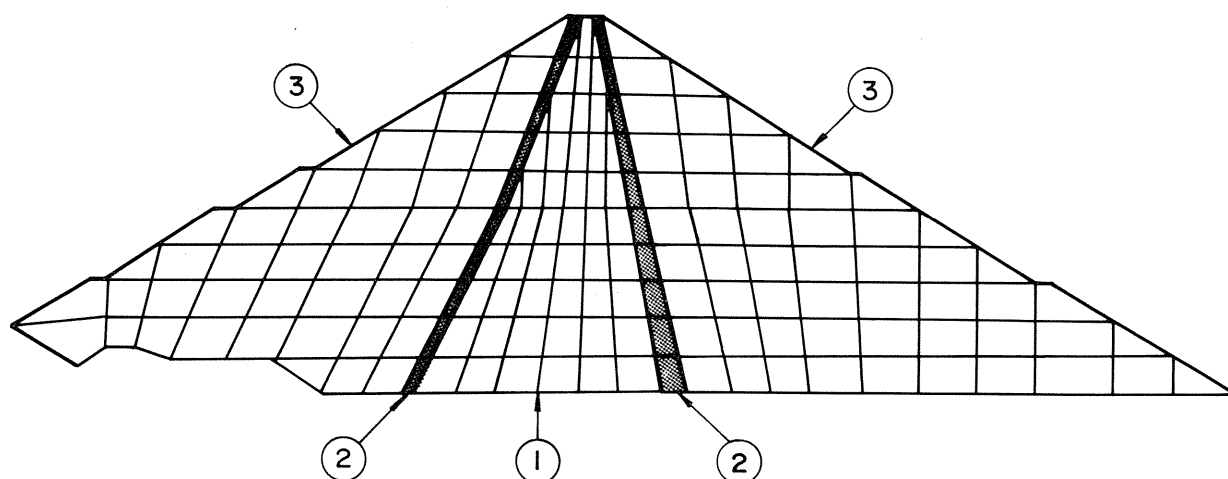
Embankment arrangement and the finite element mesh for Dartmouth Dam
